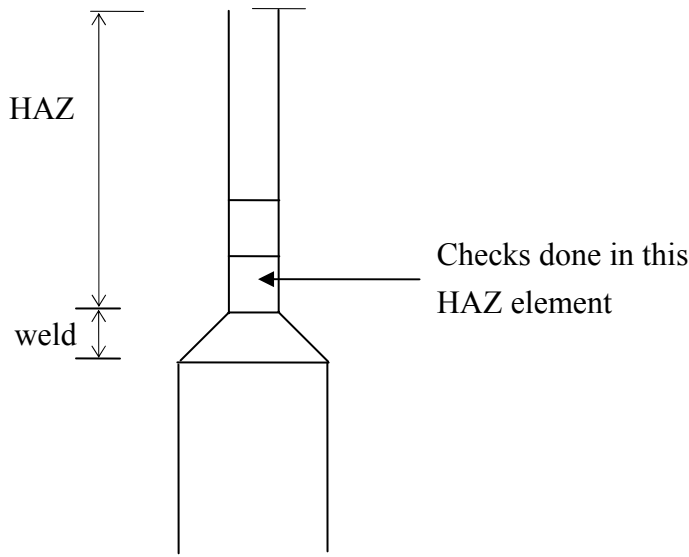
Weld and HAZ elements in a fillet-welded structure.
